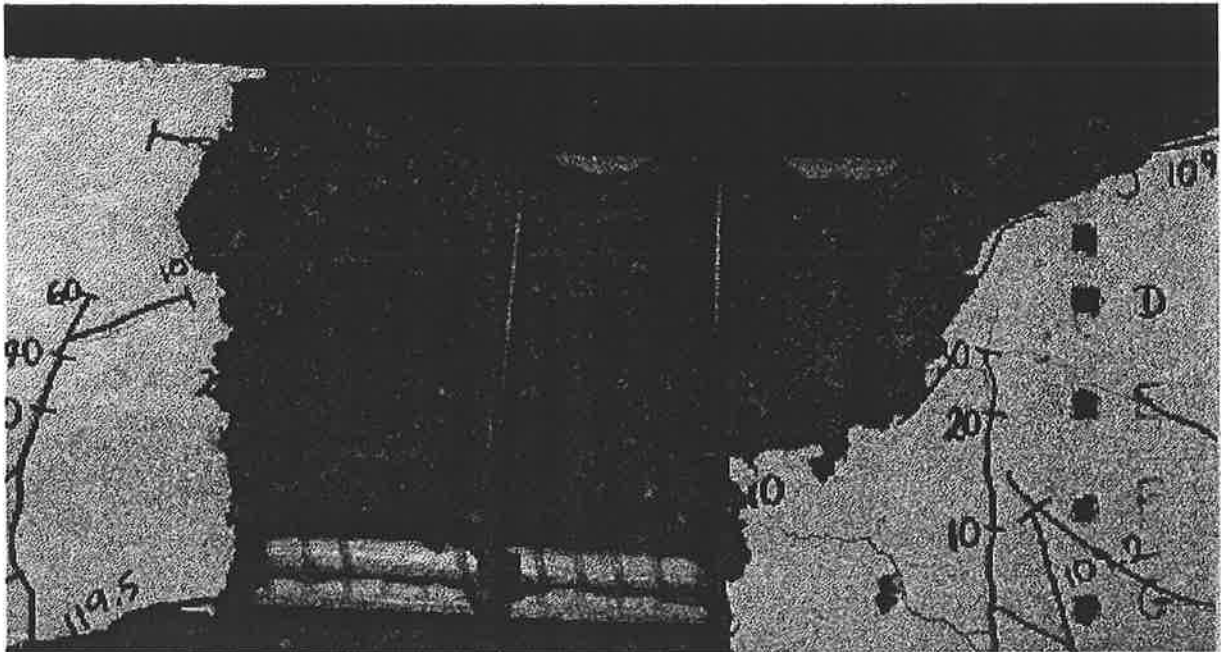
Loose concrete removed from beam 5 after failure.
